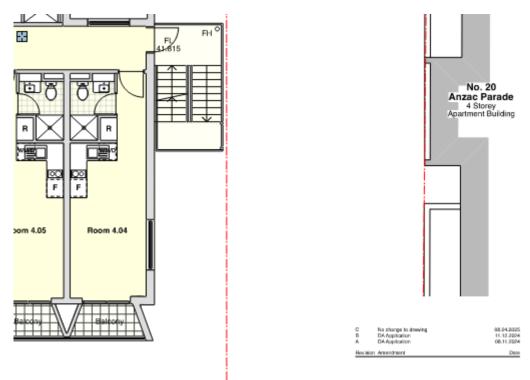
Room 4.04 showing the Balcony to the west and that the window facing 20 Anzac Parade is a secondary window and will have a sill height of 1.6m
